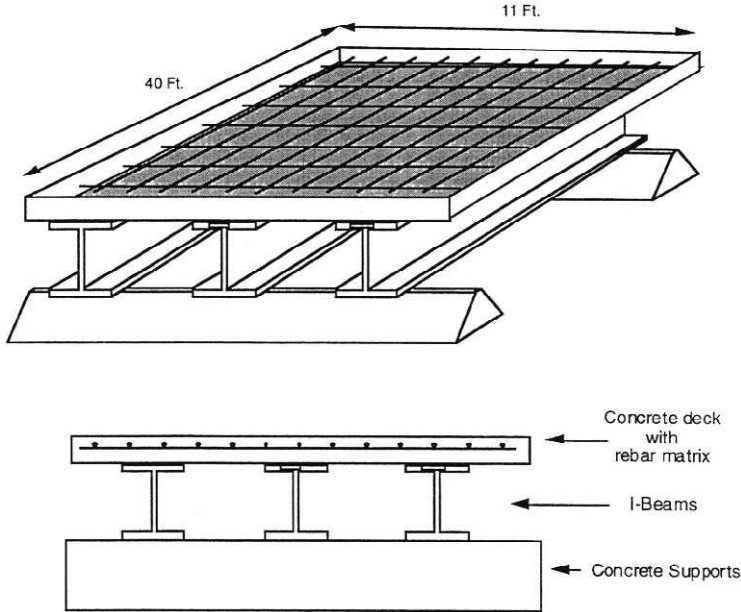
Schematic of a laboratory model of a bridge deck to be instrumented with FBG sensors for testing their damage assessment capability. From Davis, M. A., Bellemore, D. G., Kersey, A. D., Putnam, M. A., Friebele, E. J., Idriss, R. L. and Kodinduma, M., (1996a), "High Sensor-Count Bragg Grating Instrumentation System for Large-Scale Structure Monitoring Applications," *SPIE* 2718, 303–309.
